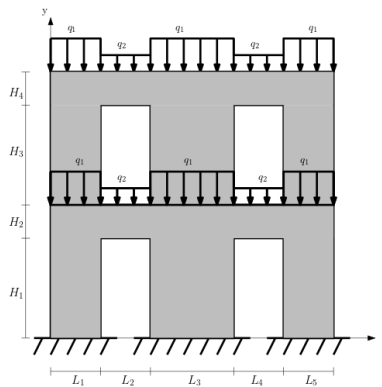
Geometry and loading conditions for the problem of the masonry façade under settlement.
